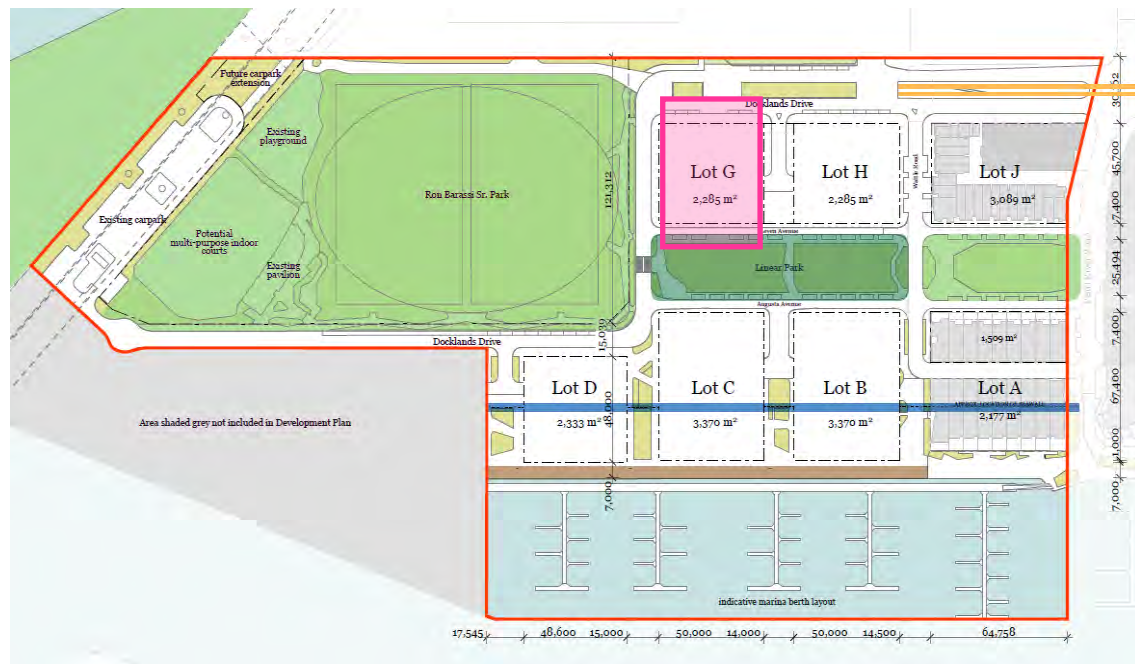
Lot G highlighted within the NewQuay West Development Plan site
